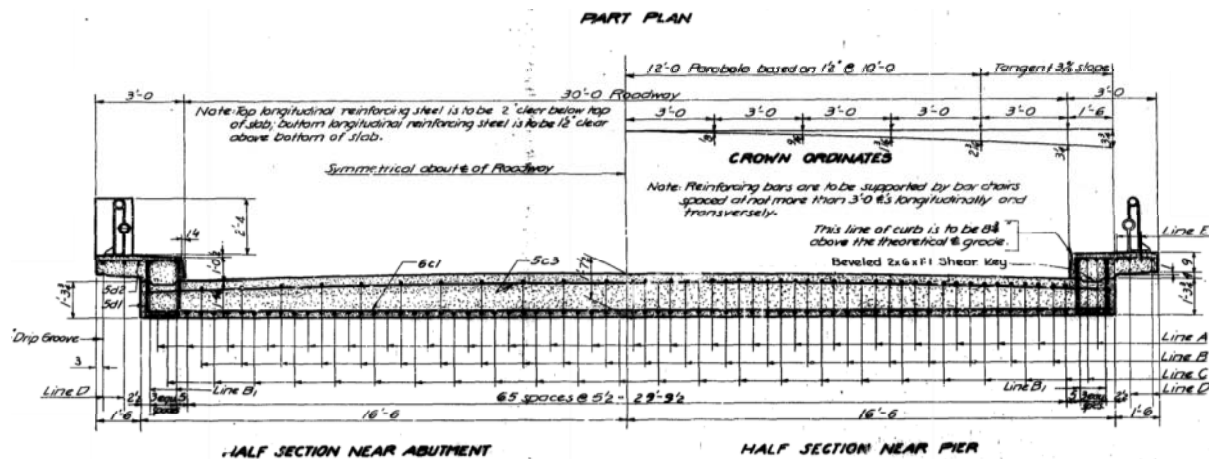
Deck half-sections near abutment and pier, showing reinforcement layout.
